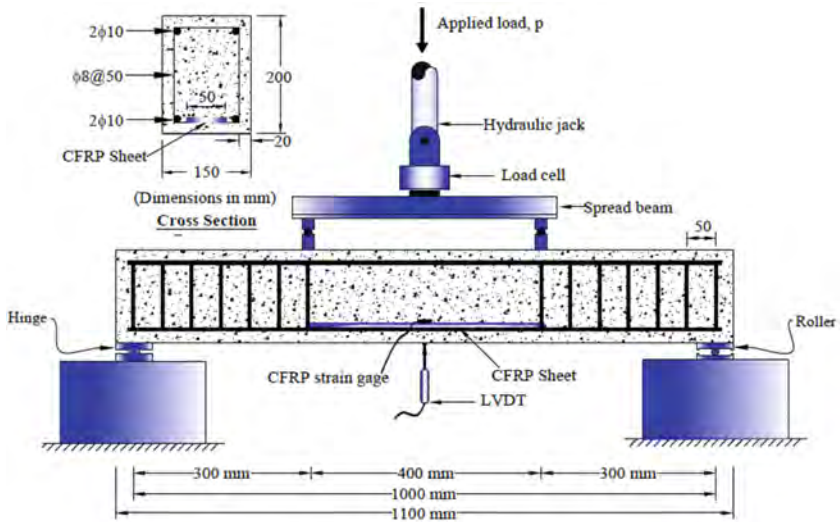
Specimens test setup, reinforcement, dimensions, and instrumentations.
